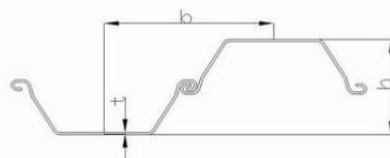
Larsen U Shaped Sheet Pile (PILEBUCK, 2014)
